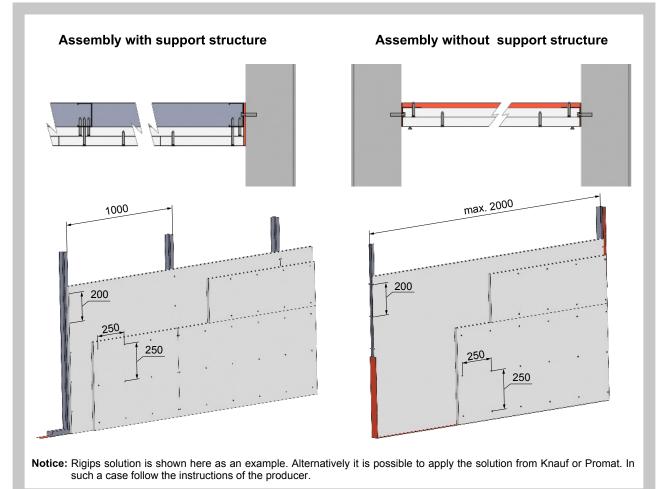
Thin shaft wall - mortar or gypsum - RECTANGULAR DAMPER
